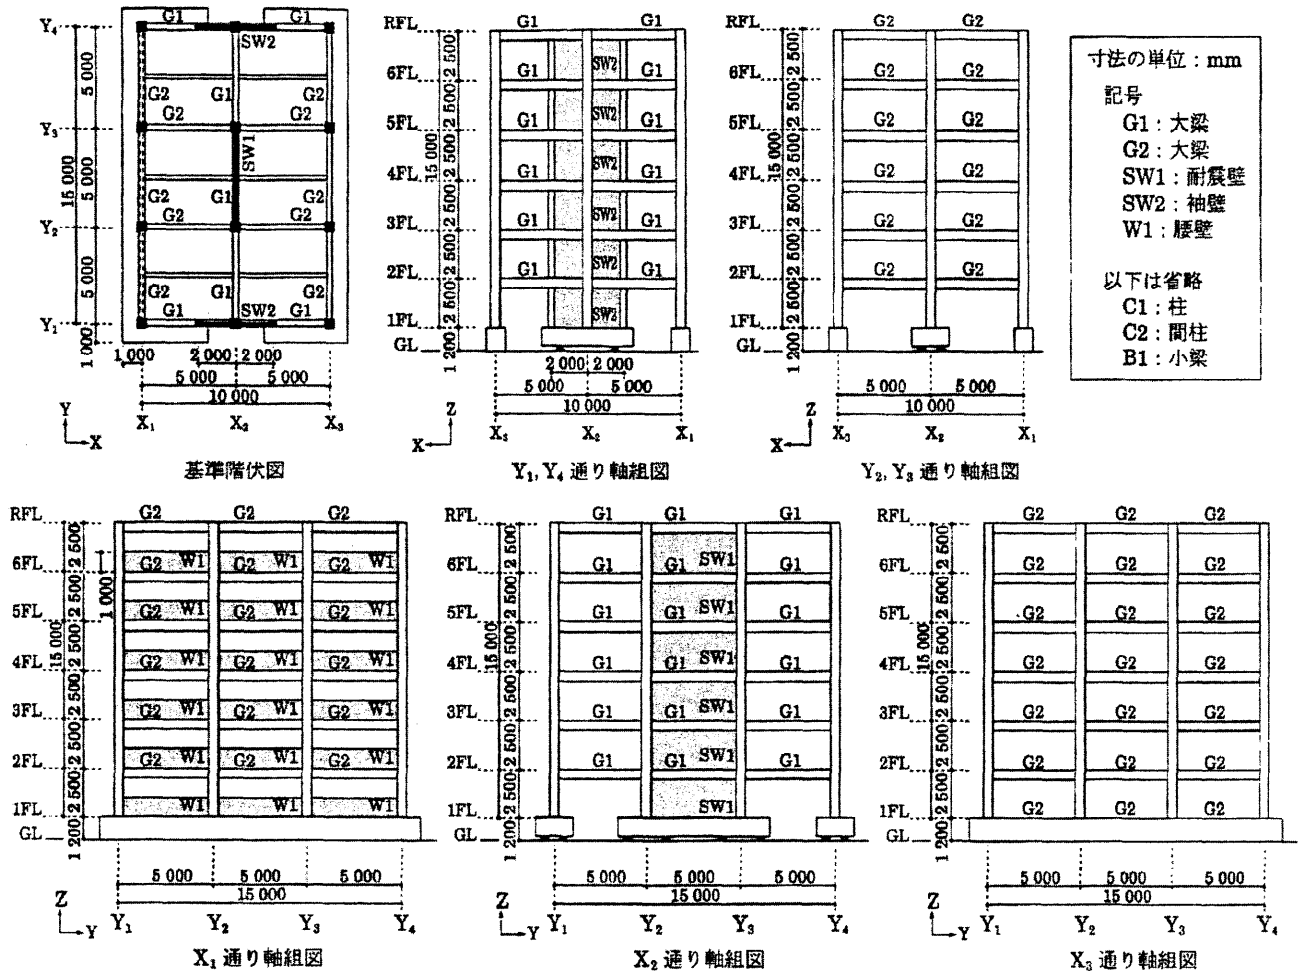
Typical floor plan and framing elevation<sup>10)</sup>
